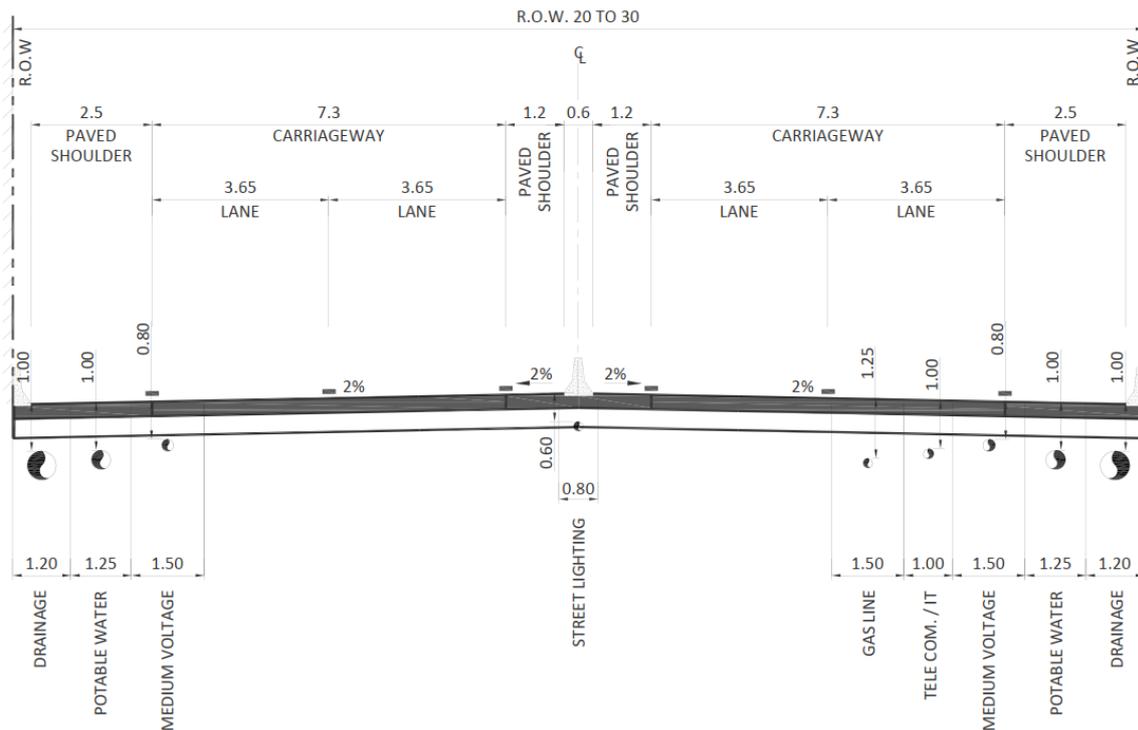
Typical Cross Section for Dual Carriageway/ Roads
